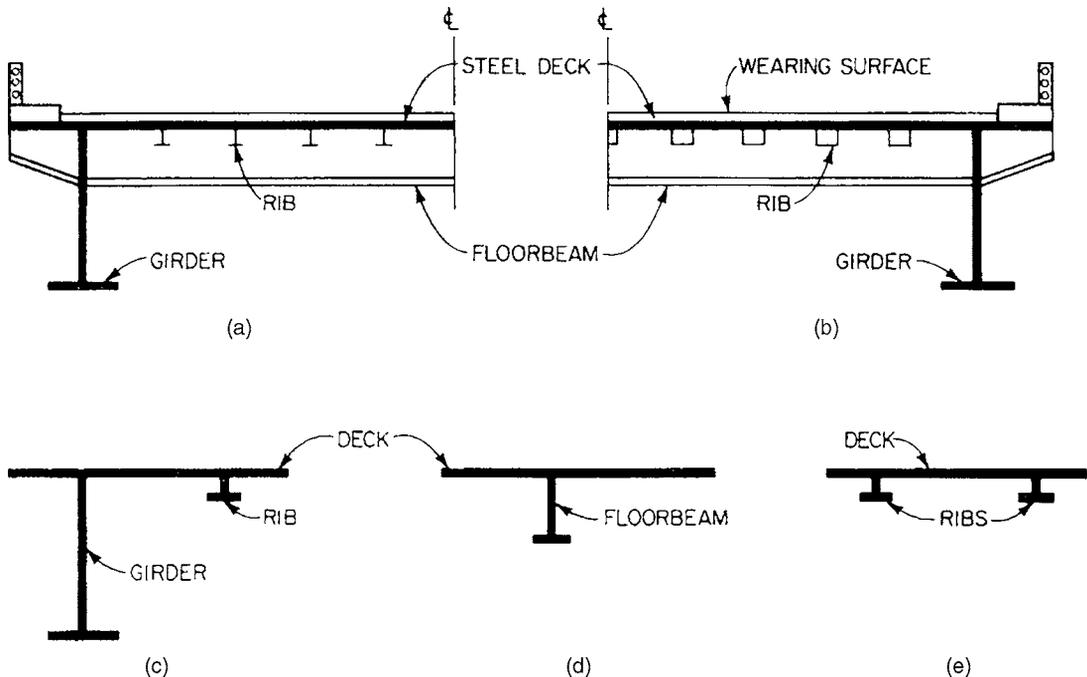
Orthotropic-plate construction. (a) With open ribs. (b) With closed ribs. (c) Deck and ribs act as the top flange of the main girder. (d) Deck acts as the top flange of the floorbeam. (e) Deck distributes loads to the ribs.
